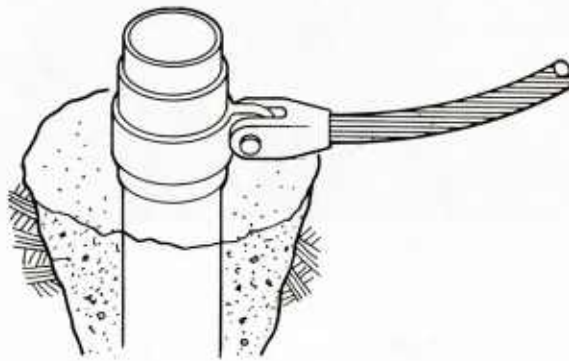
Drilled and grouted pile anchor with rotatable head connection.
